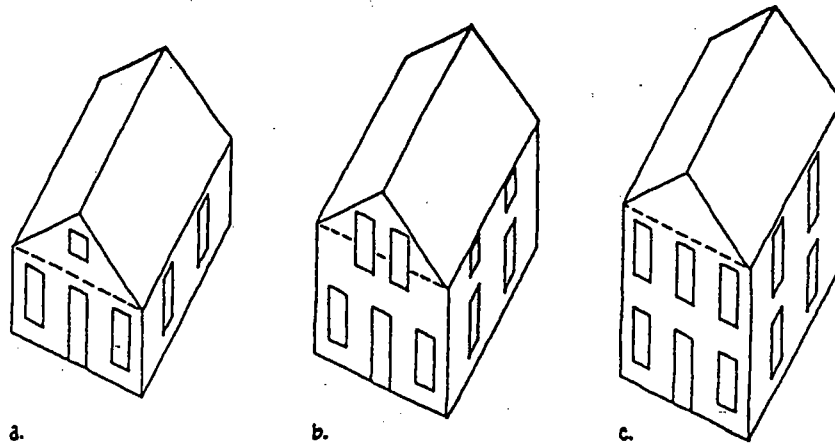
Wall height guidelines illustrated, note the eave line: a) one story, b) one-and-one-half story, c) two story (after Murphy).
